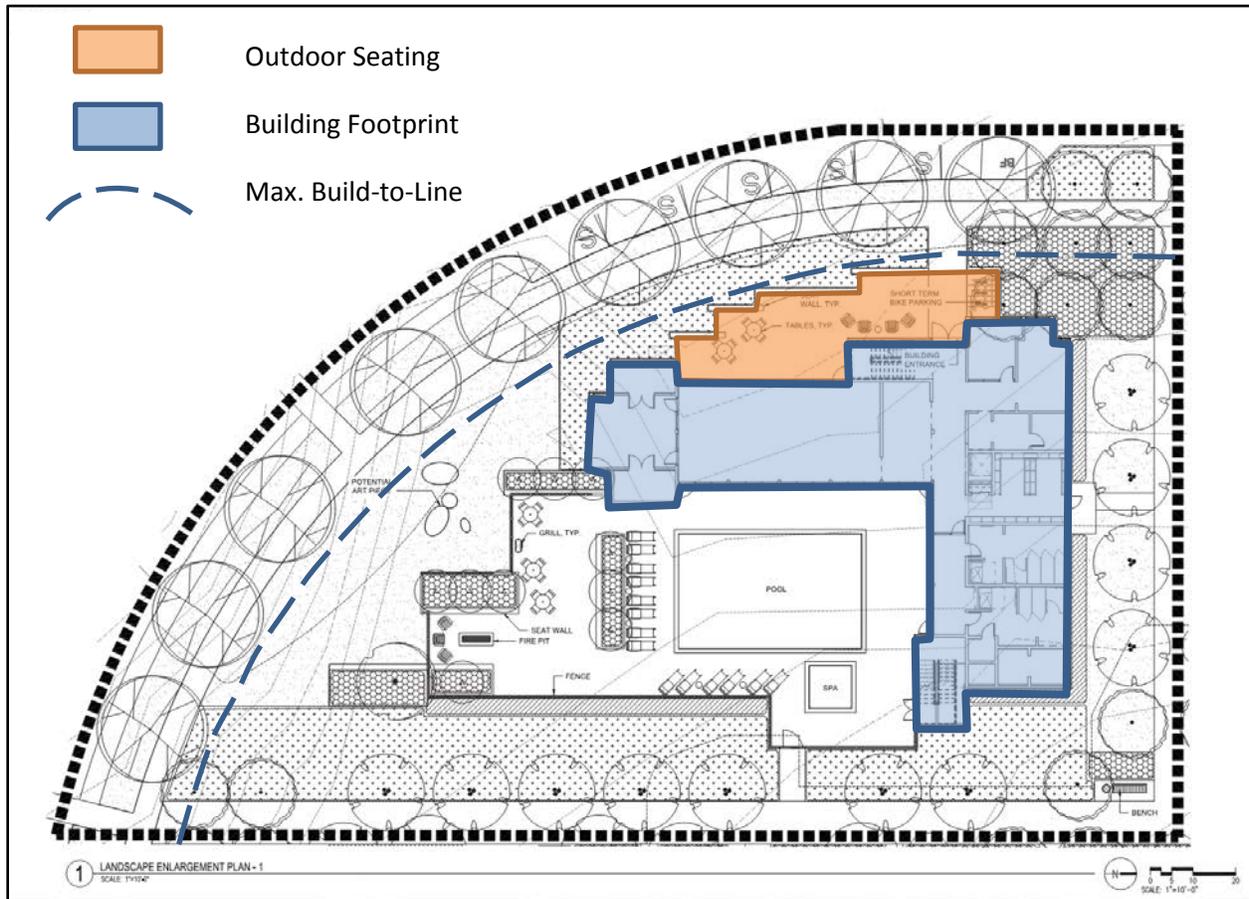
Detail plan of the clubhouse showing its relative location to the maximum Build-to-Line (dash line) and outdoor seating visible from the street.
